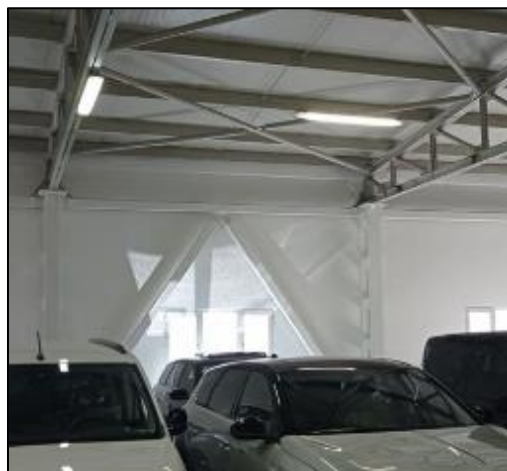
Photo demonstrating a properly detailed gusset plate connection ensuring a continuous lateral-load path
